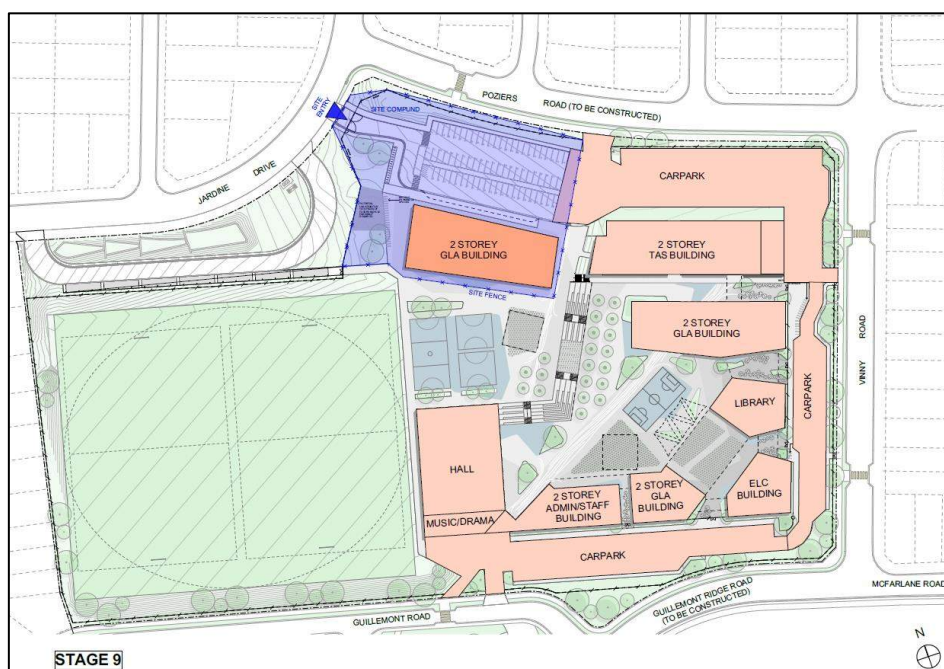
SFCC Masterplan - Stage 9 (Source: JDH Architects)
